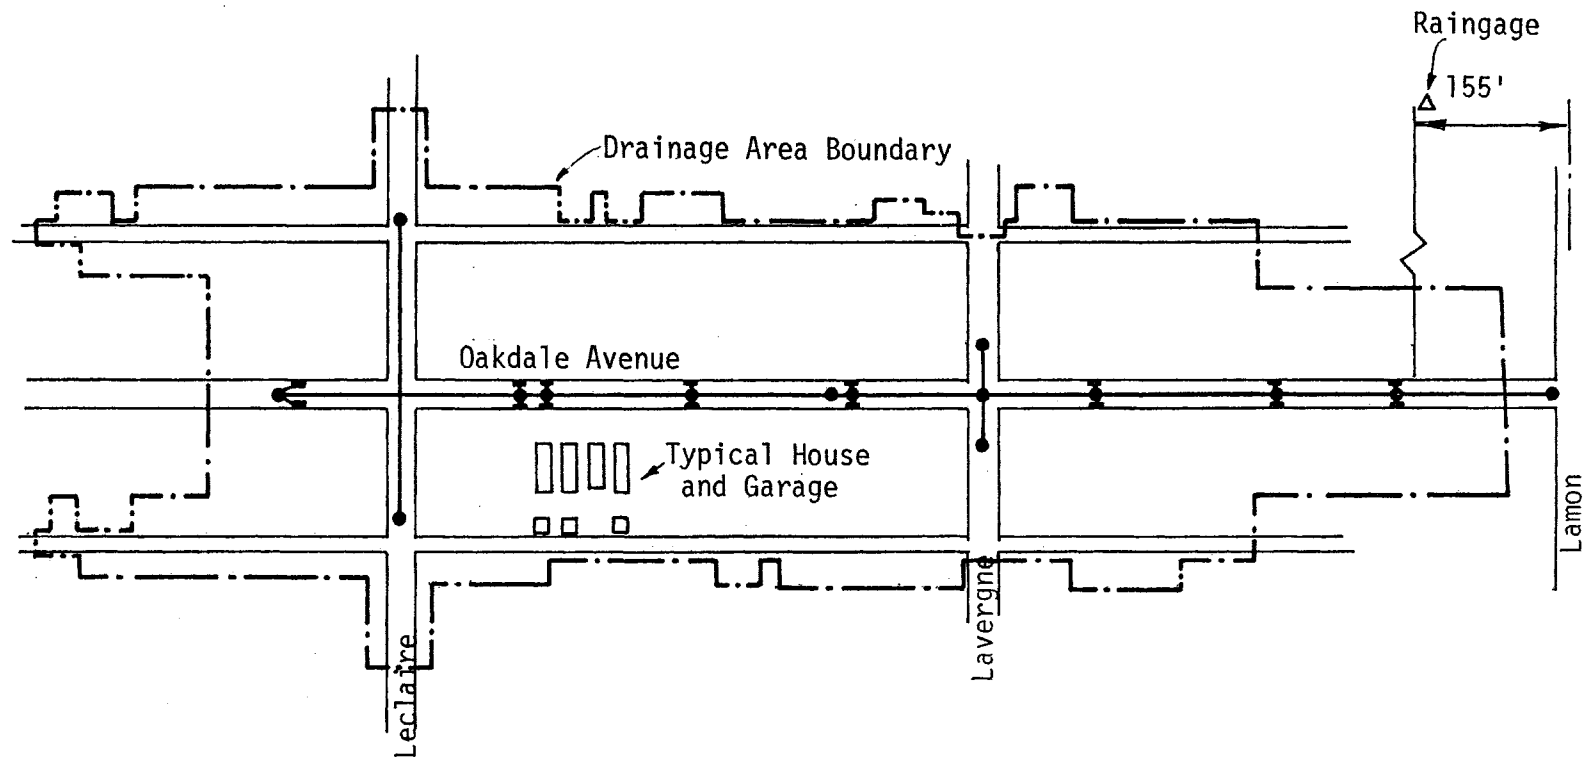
General Plan of Oakdale Avenue Drainage Basin, Chicago (19)
